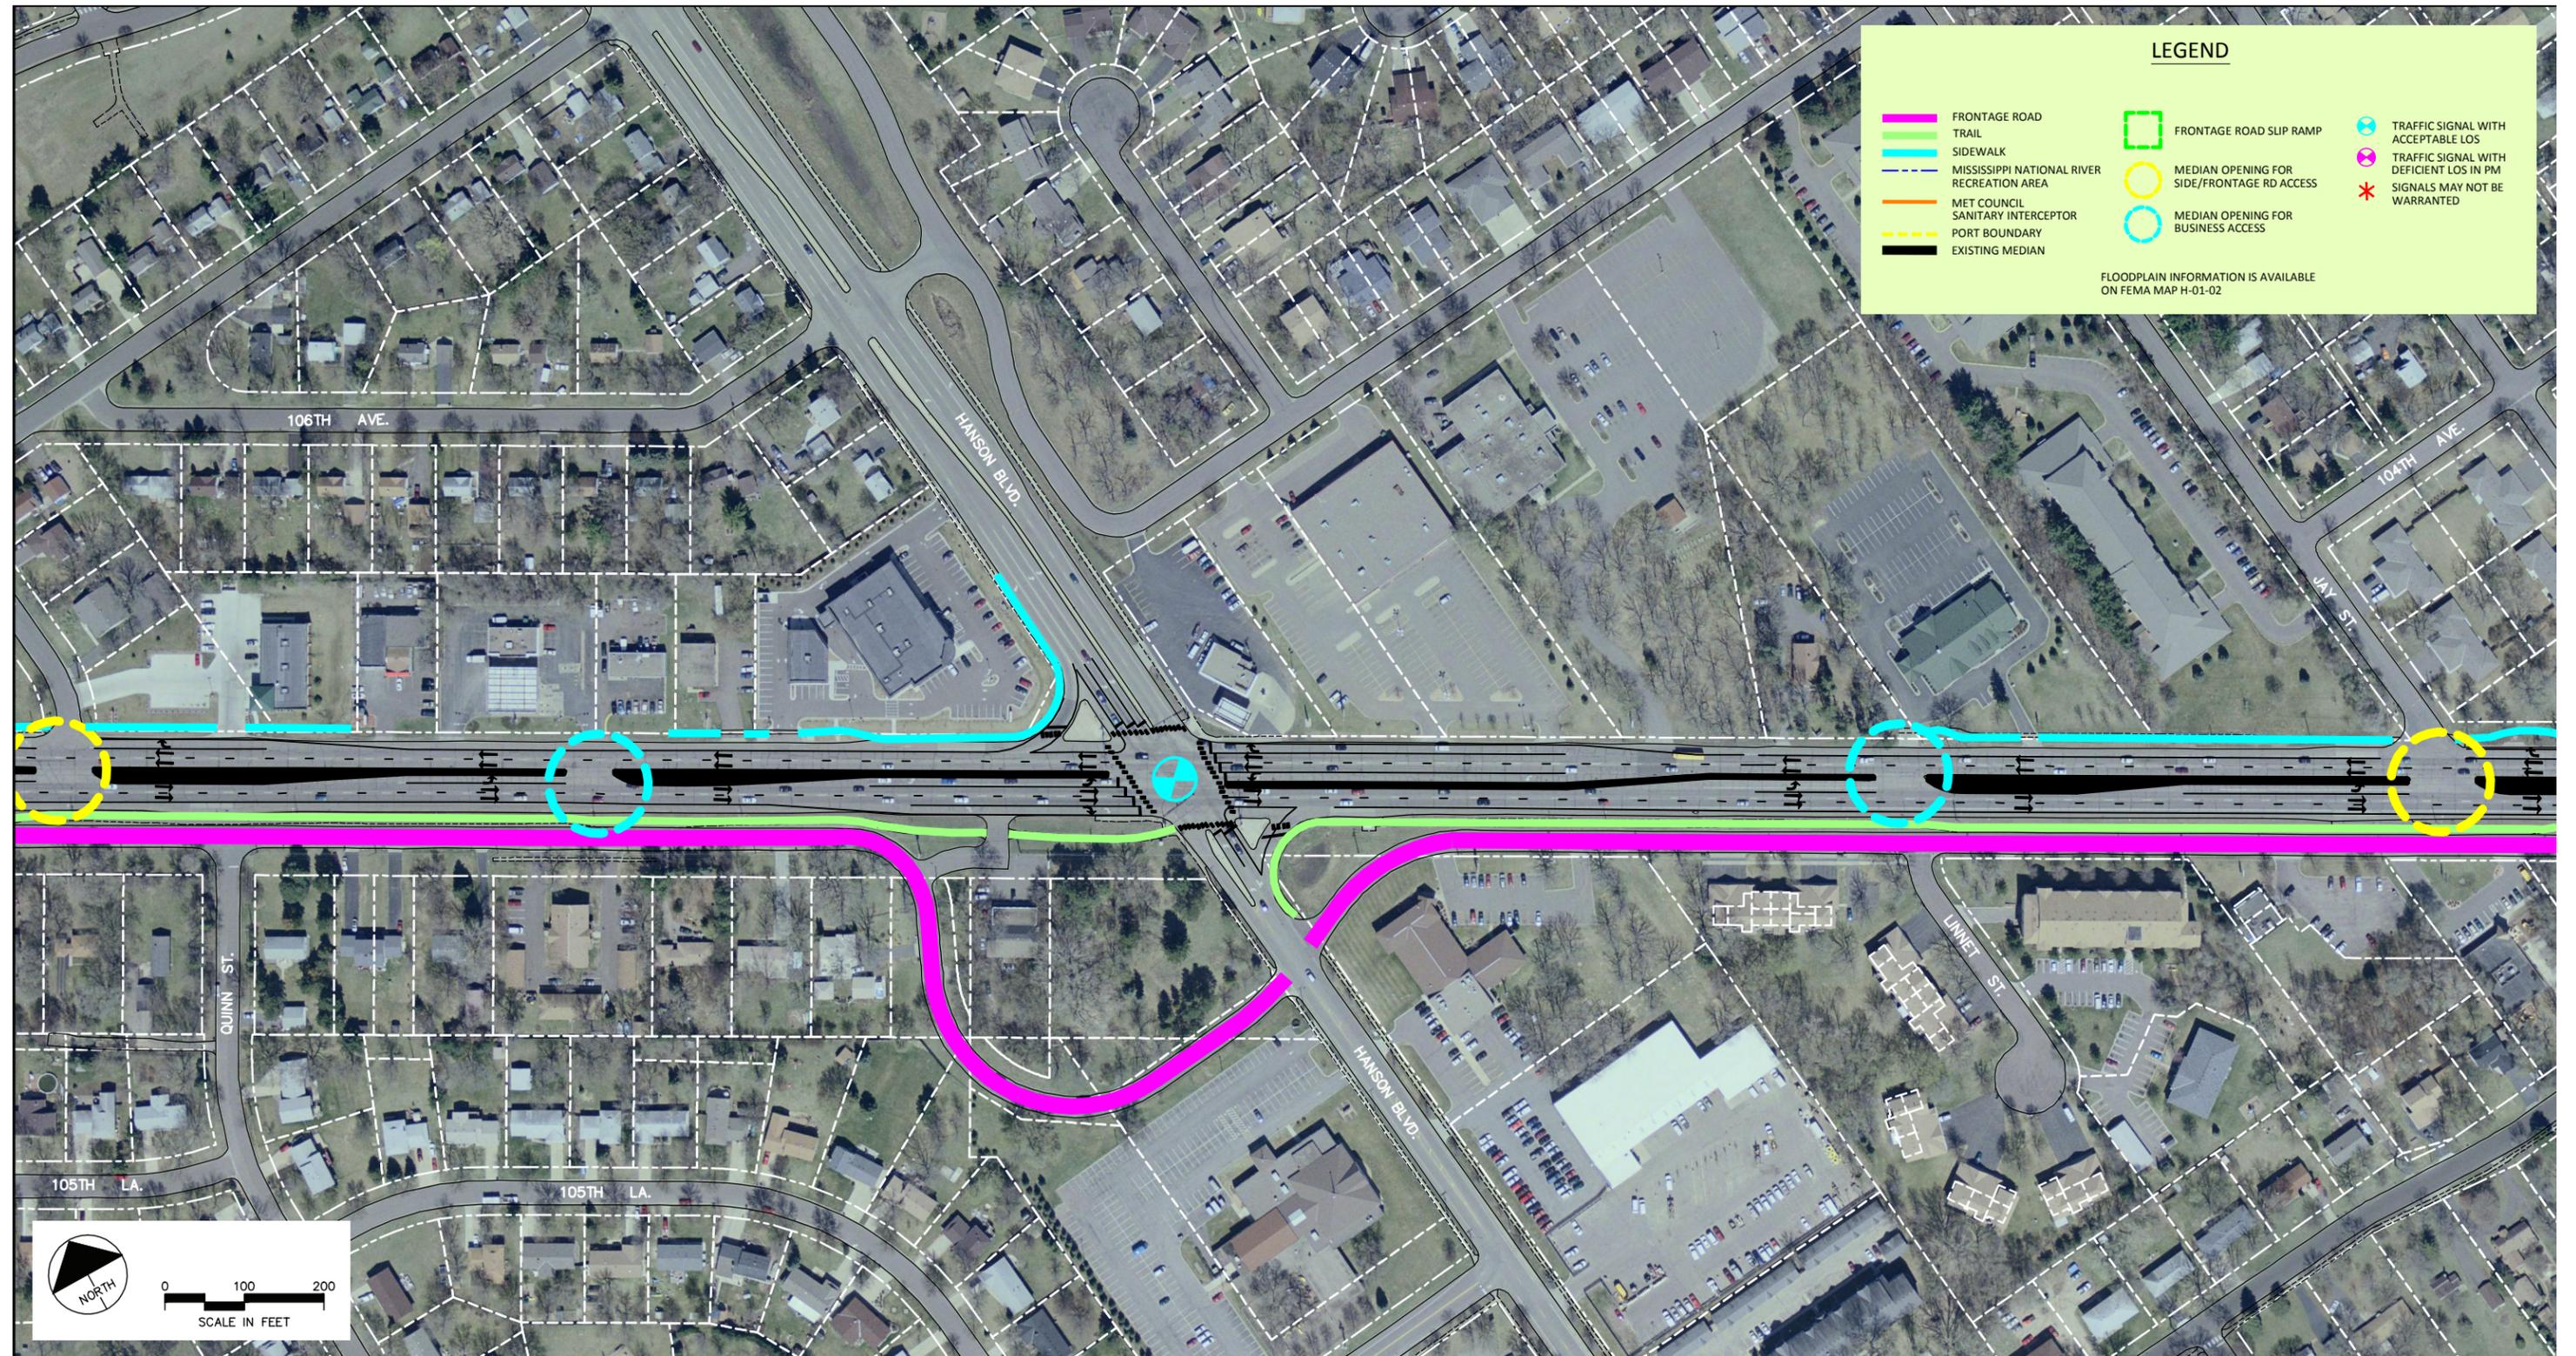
Existing Roadway Features (8 of 15)
